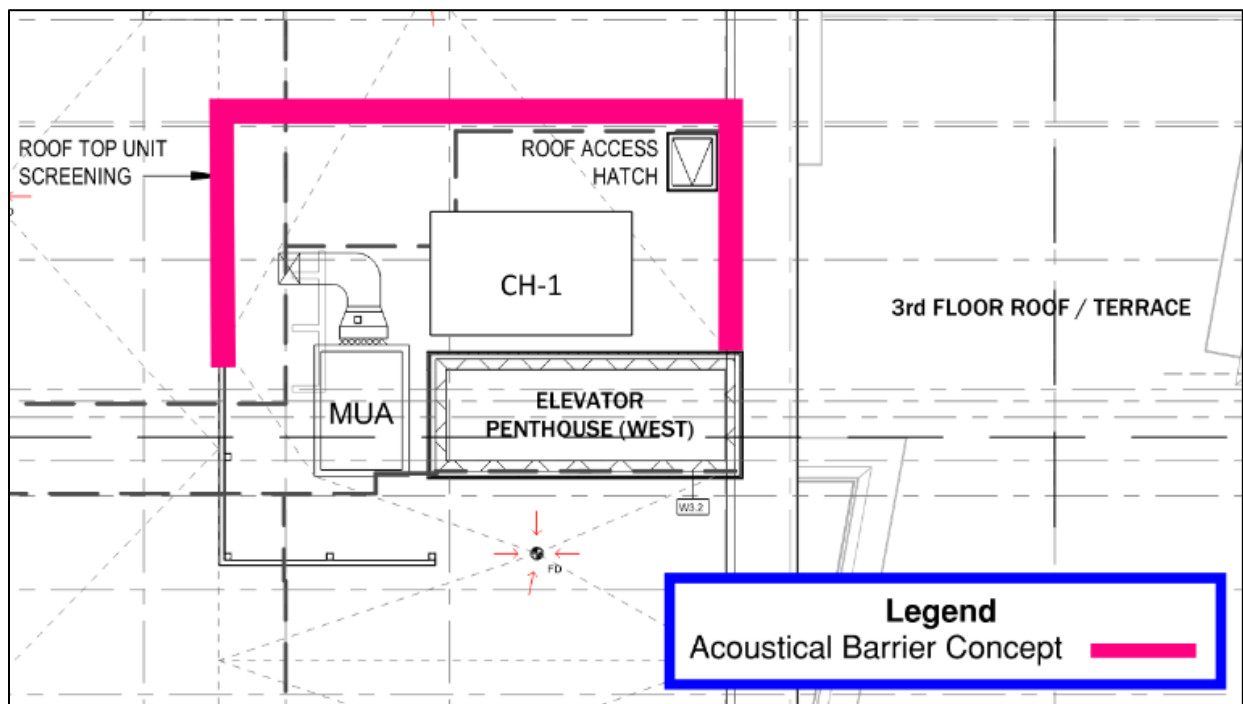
Schematic Showing Acoustical Barrier's Original Proposed Outline
